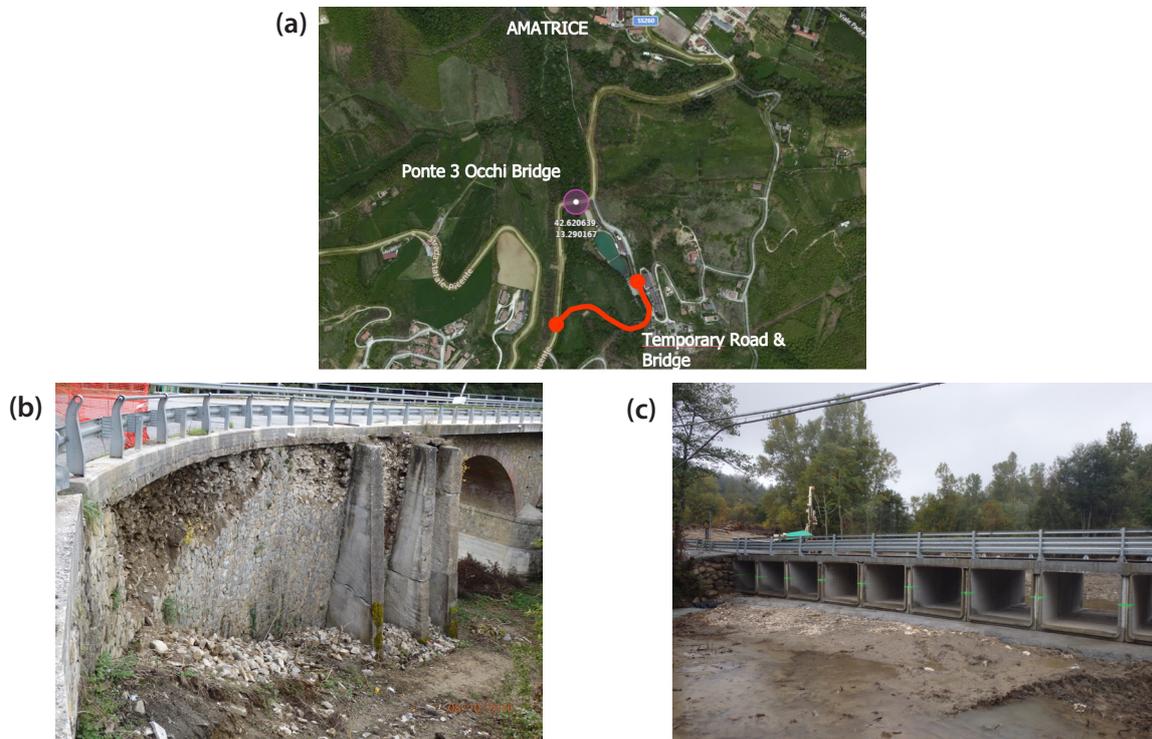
(a) "Ponte a 3 Occhi" bridge map, (b) damage to bridge, and (c) new by-pass road bridge.
